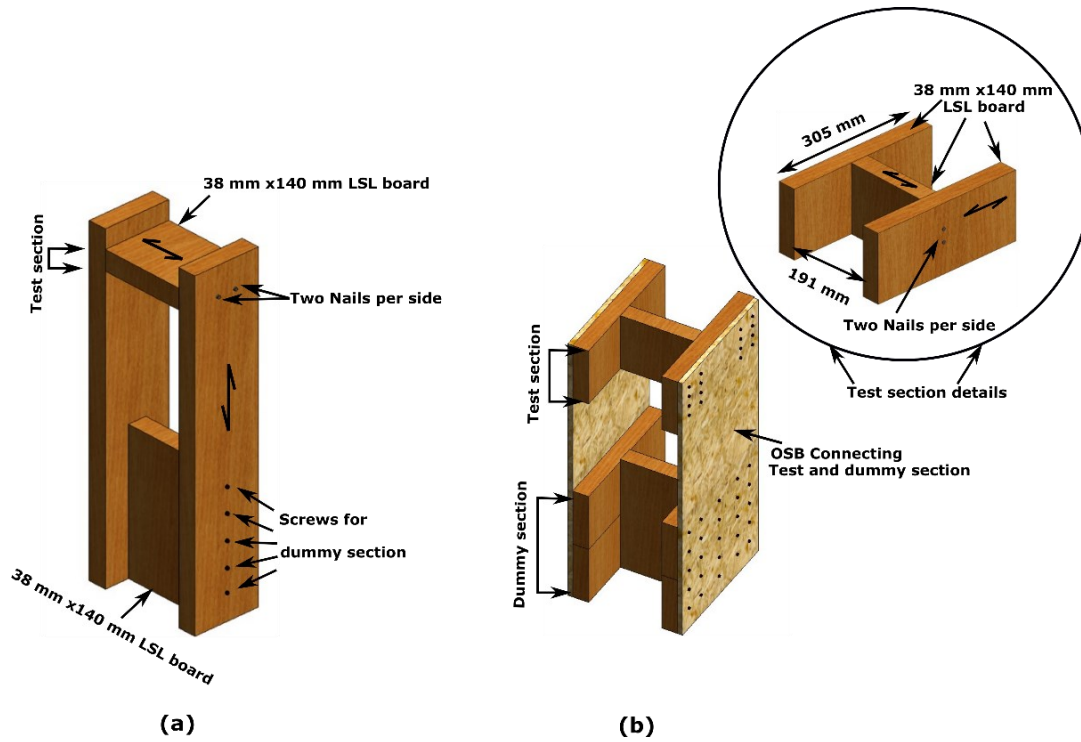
(a) Sample B construction details, (b) Sample C construction details
